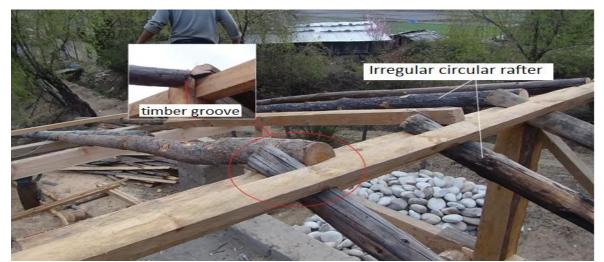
Roof ridge connection in rural home roof with deep groove and lap joint
